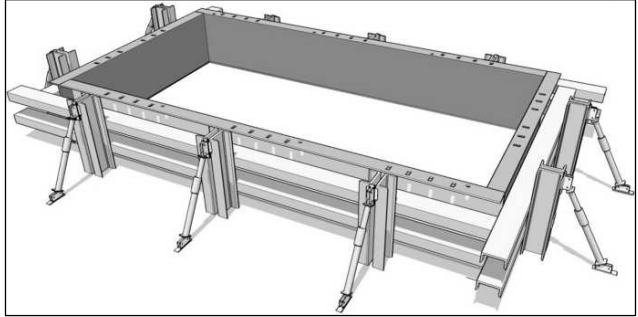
Isometric View of All Steel Foundation Formwork.
